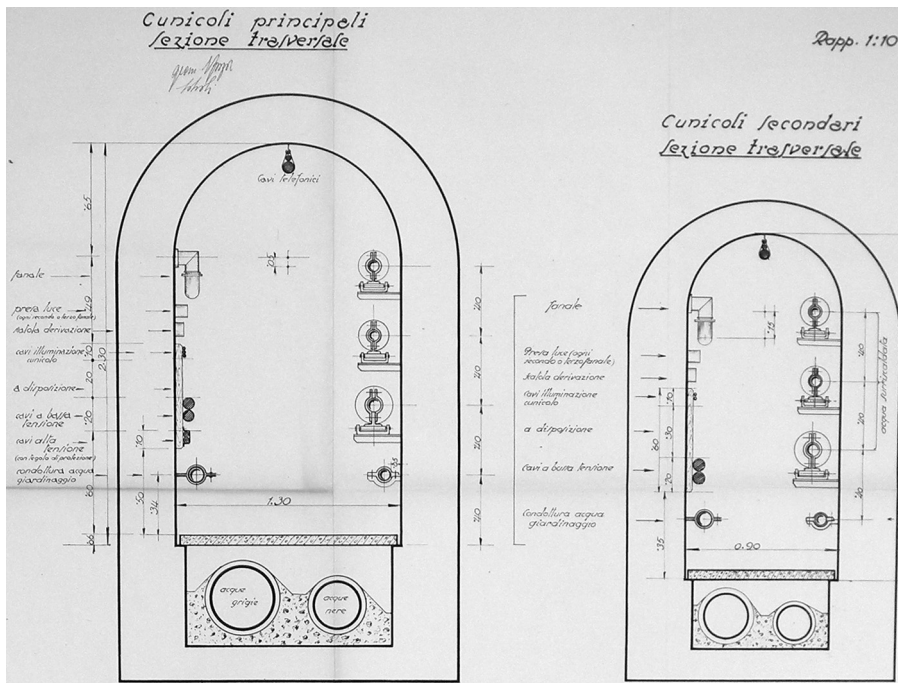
Underground facilities. Cross section of the main and secondary tunnels (Archivio Storico Ospedale Morelli).
